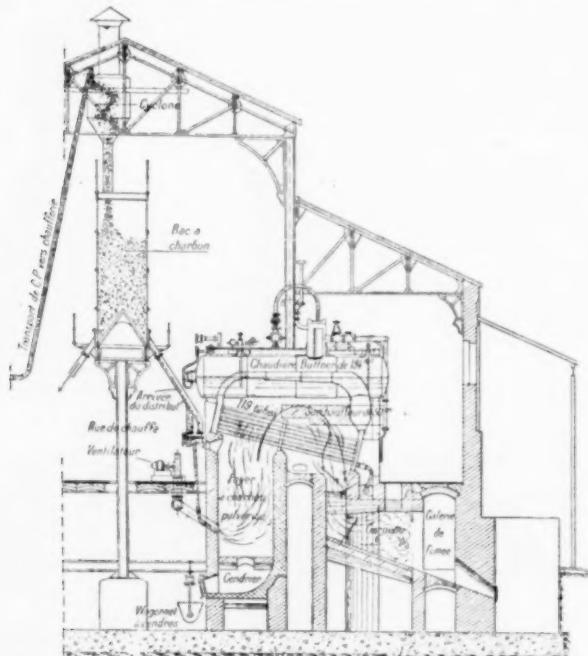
DIAGRAMMATIC VIEW OF THE BUTTNER BOILER EQUIPPED FOR BURNING PULVERIZED COAL
